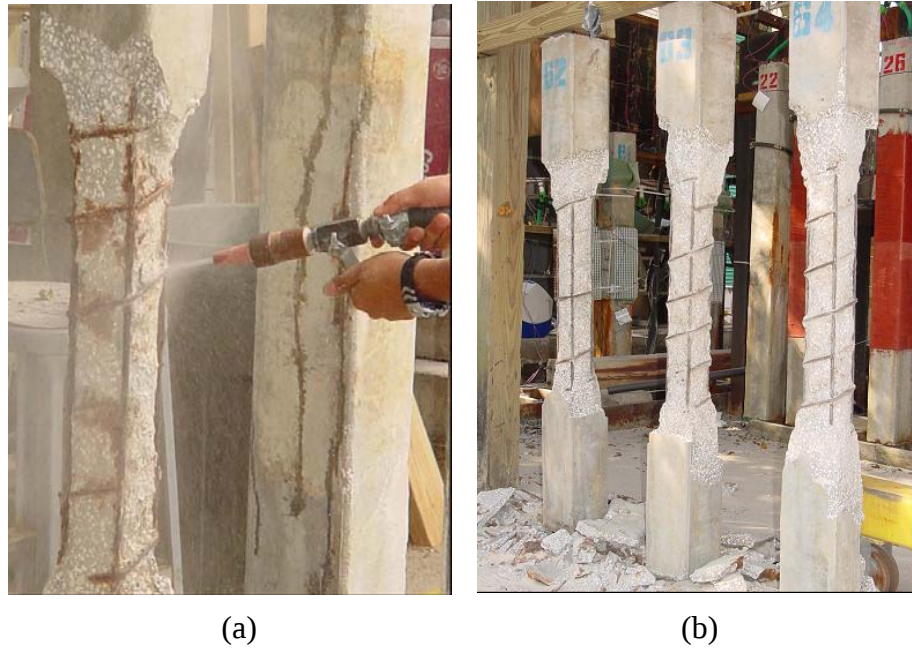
(a) Sand Blasting; (b) Cleaned Surface
